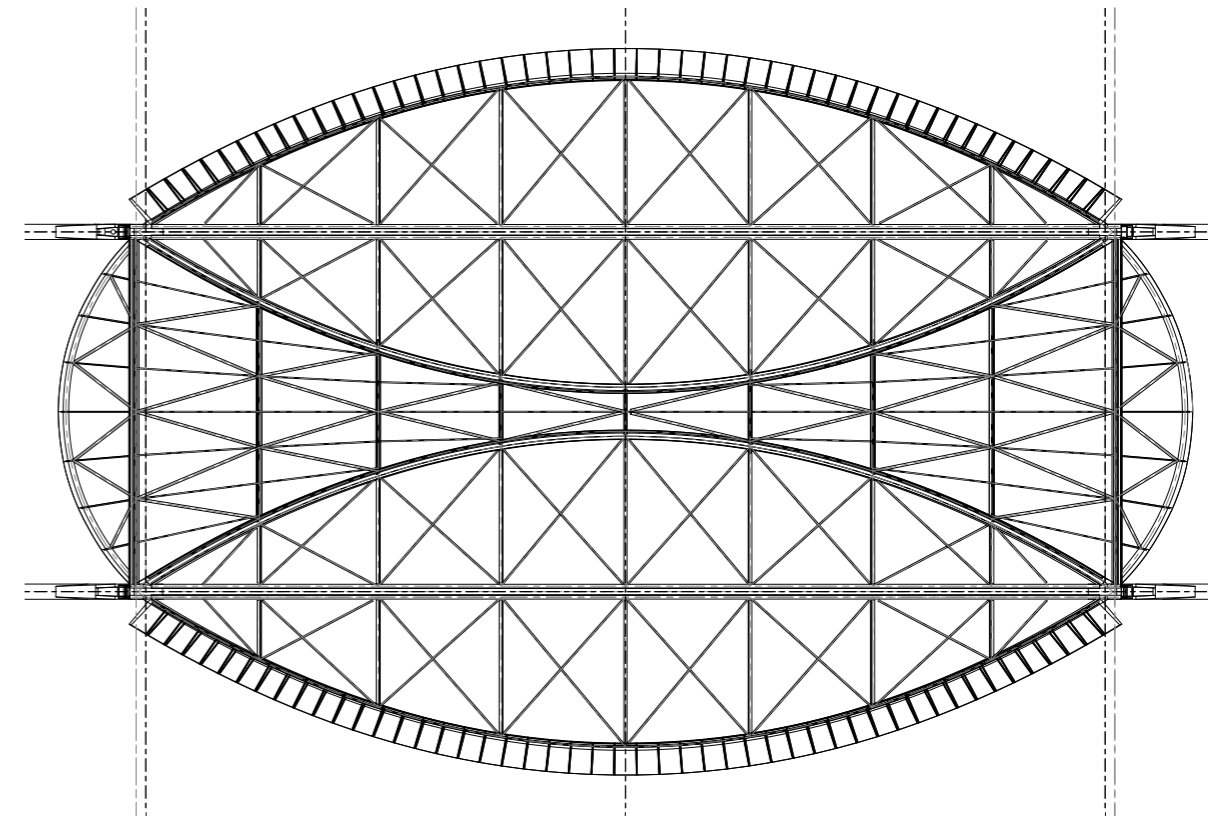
Canopy Structure Plan. Source: HASSELL
